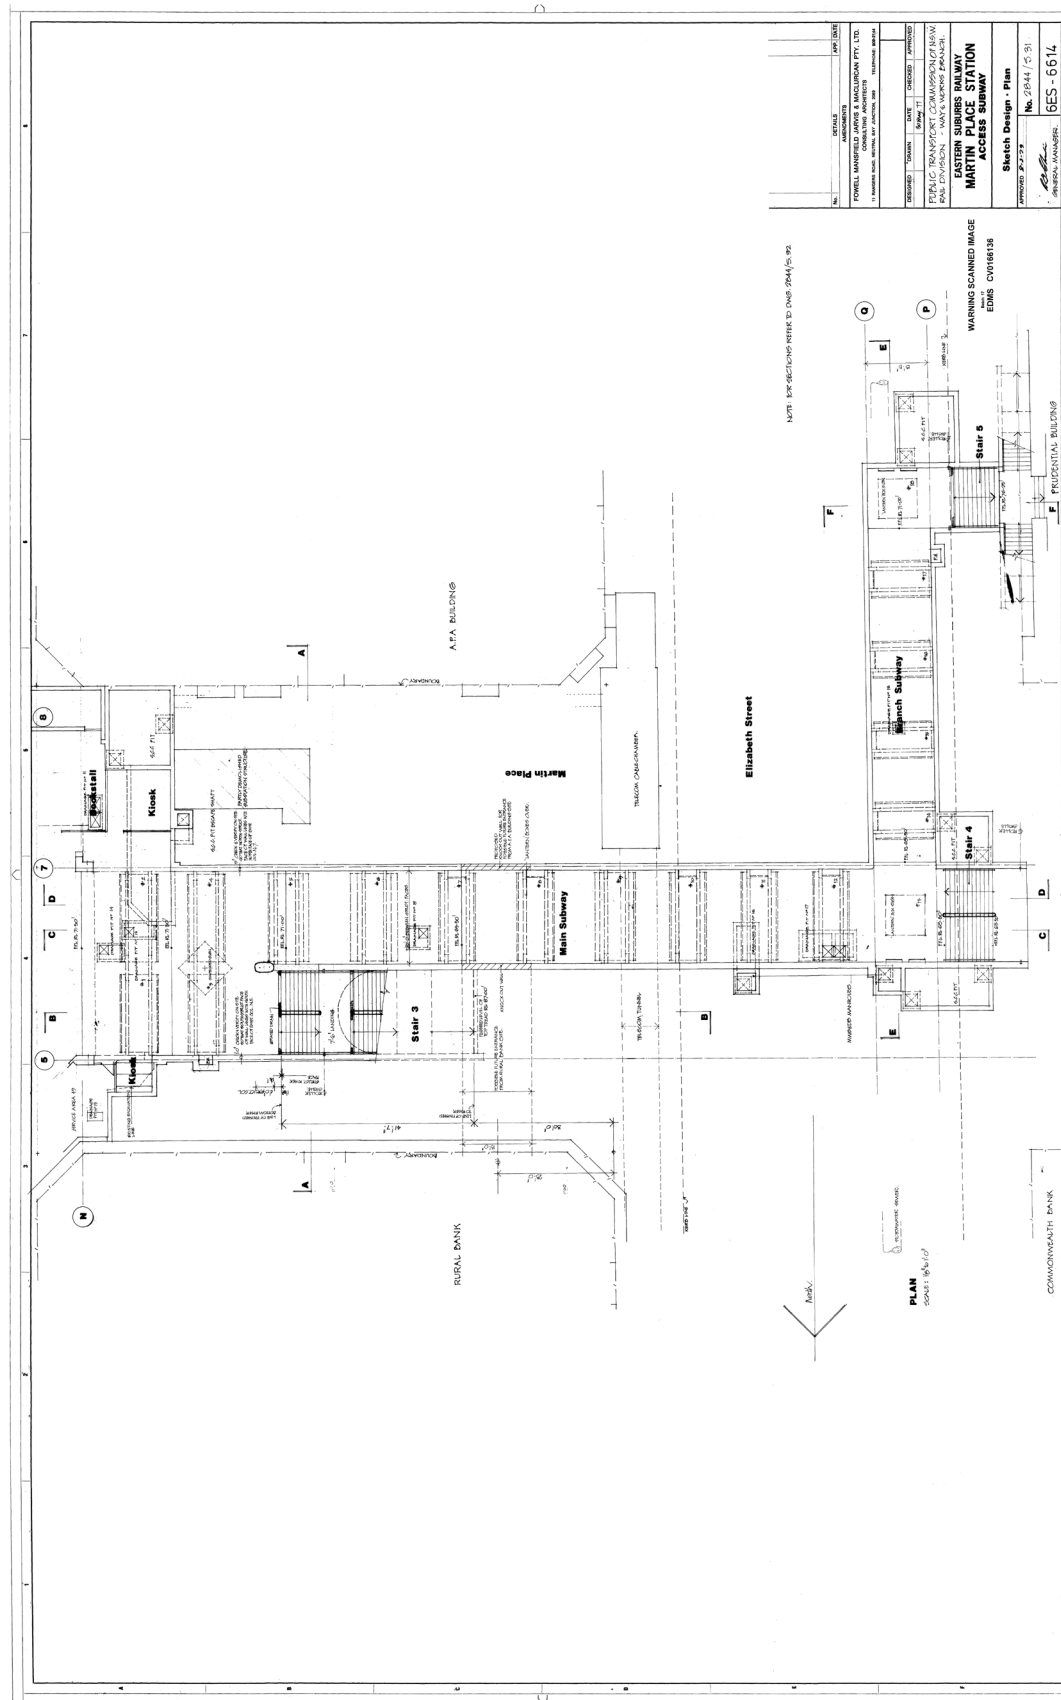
ESR PCS Access Subway Sketch Plan, 1979. Source: Sydney Trains Plan Room.
